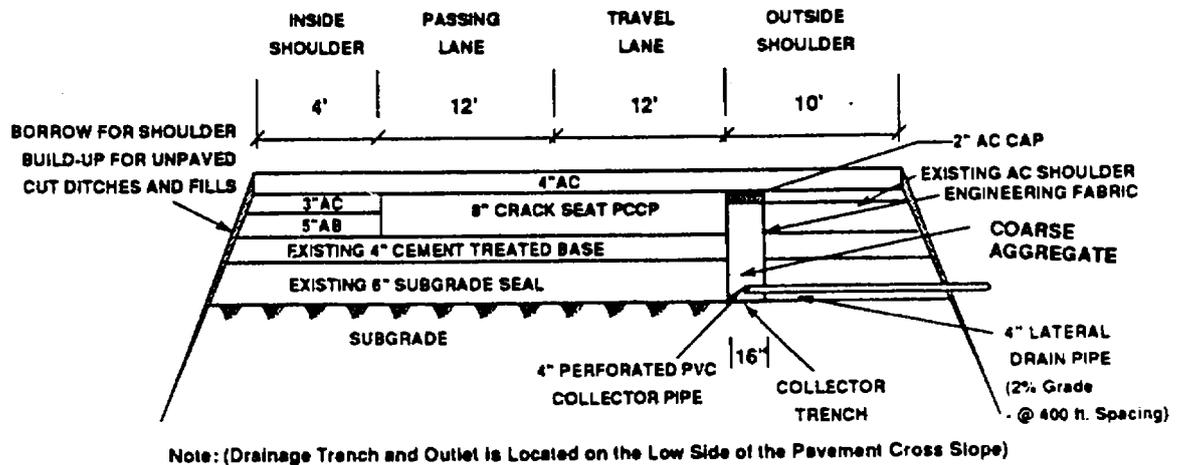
Typical section of the cracked and seated pavement with overlay
